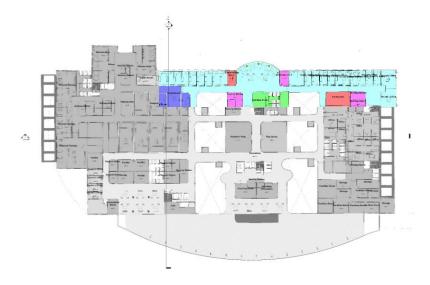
Clinical Ward's Floor Plan (Image credit by the author)
